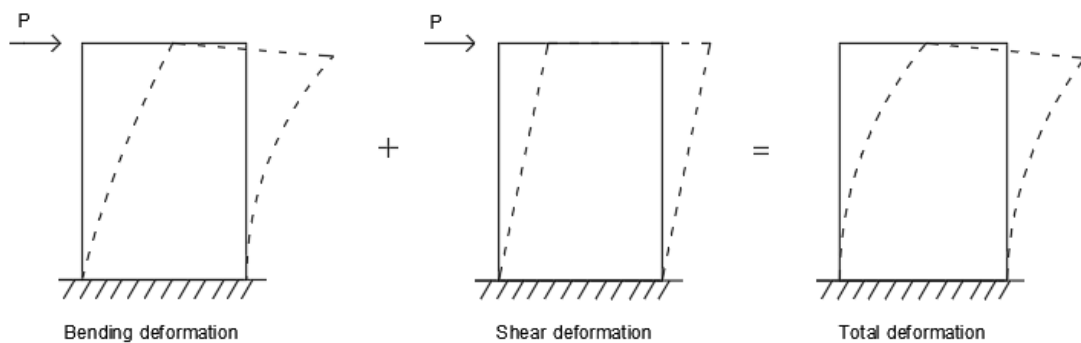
Shear and bending deformation contribution to the total deformation of a cantilever wall.
